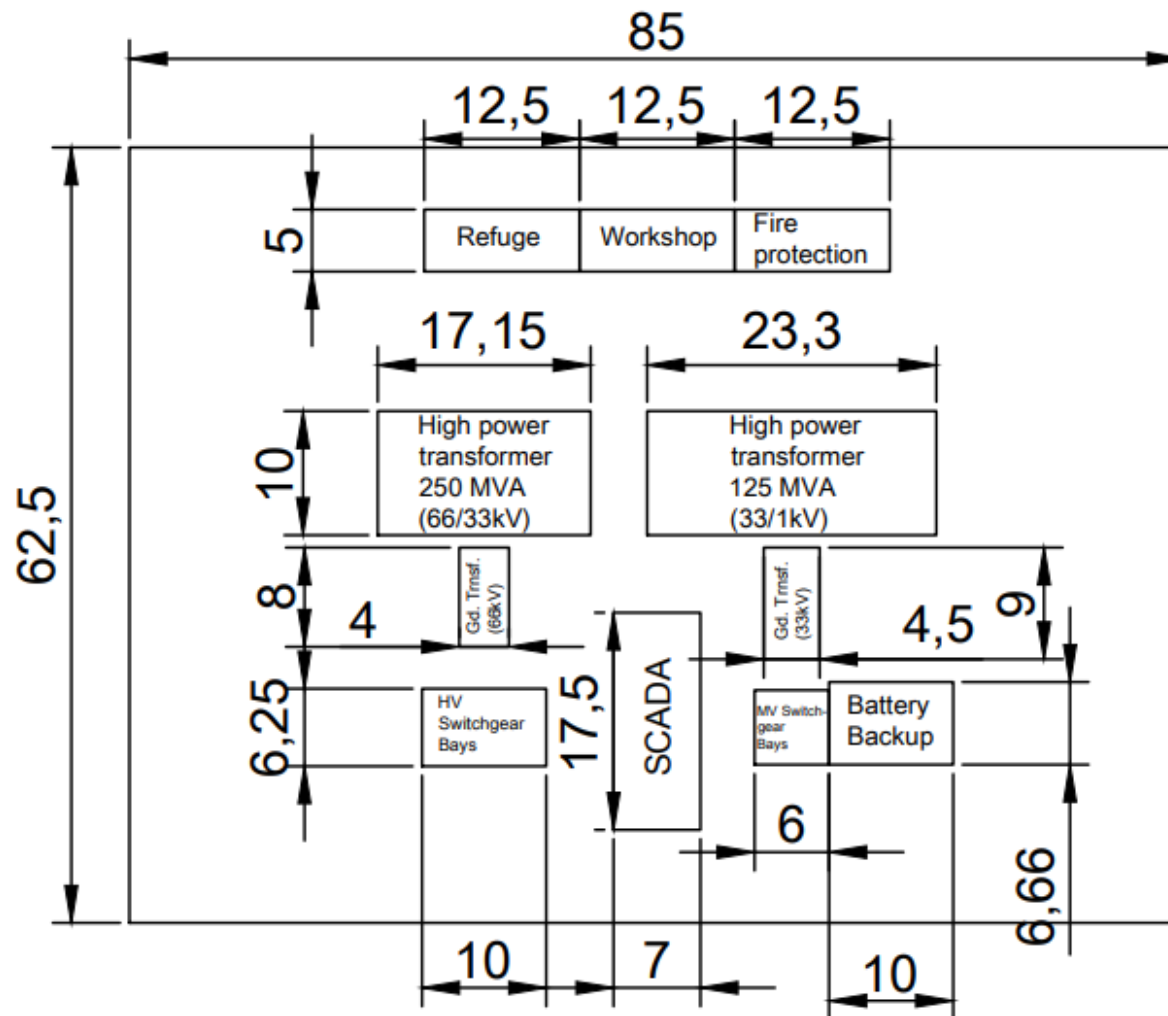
Deck #2 2D Layout at 28 meters (Main Deck)
